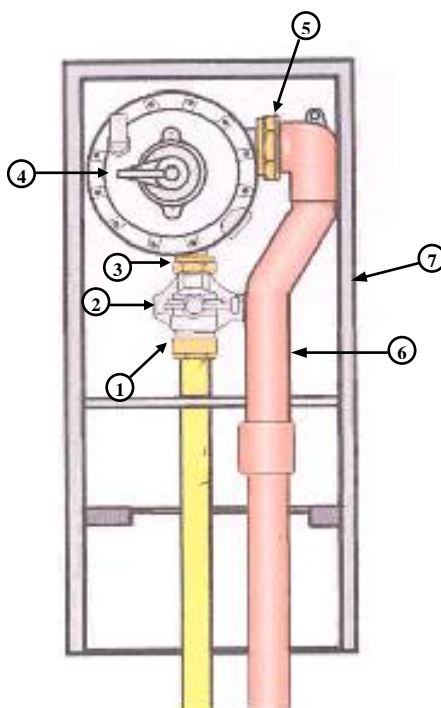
Indicative configuration of a low-pressure regulator installed in a box. The protective box shall be properly constructed to permit an alternative outlet from the right side view of the box.
